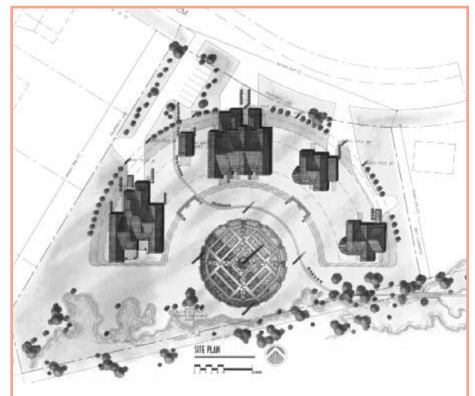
Example of mixed housing types laid out around shared garden from Seabird Island First Nation.²⁸
